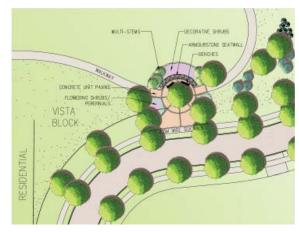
Vista Block Typical Entry Demonstration Plan
